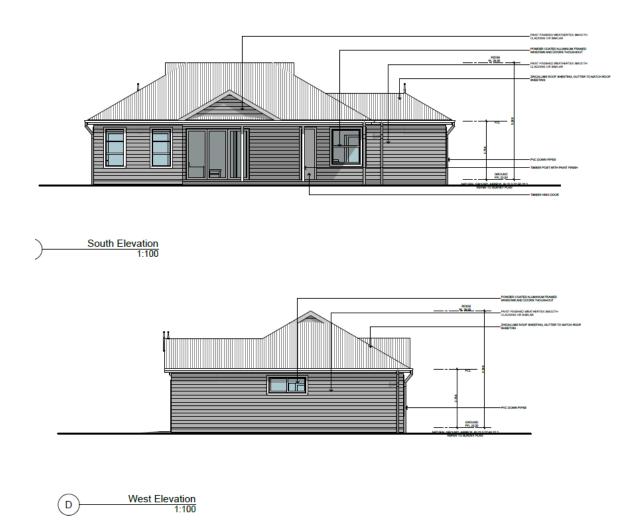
Detailing the south and west elevations of the proposed secondary dwelling
